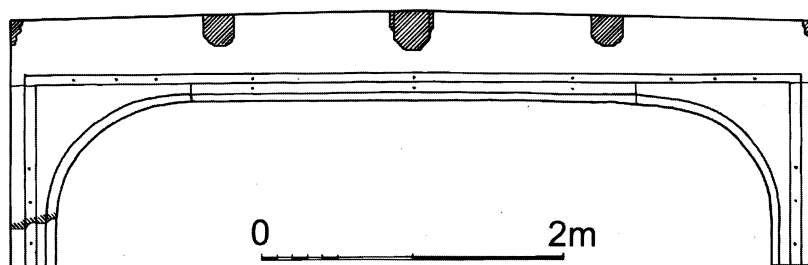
Aveley, St. Michael, the nave roof (westernmost truss).
